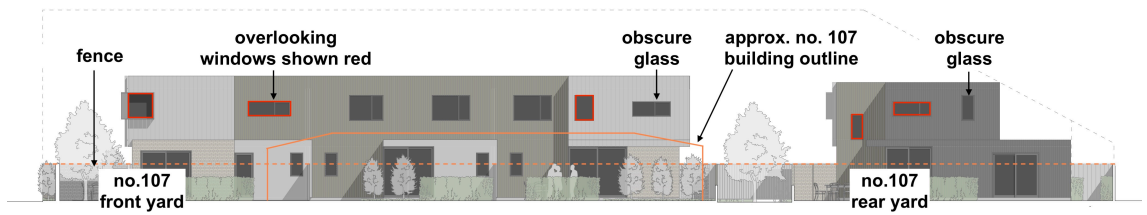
West Elevation (dwelling 1 on left, dwelling 4 on right)
